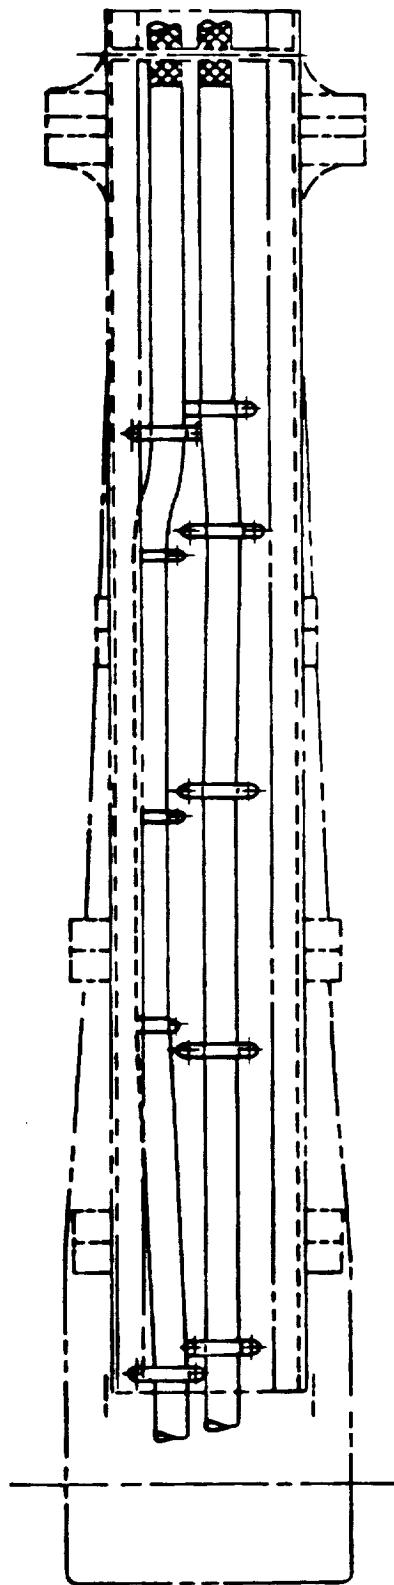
Cable Tunnel with Cables (from NASA Drawing 82631003109)
